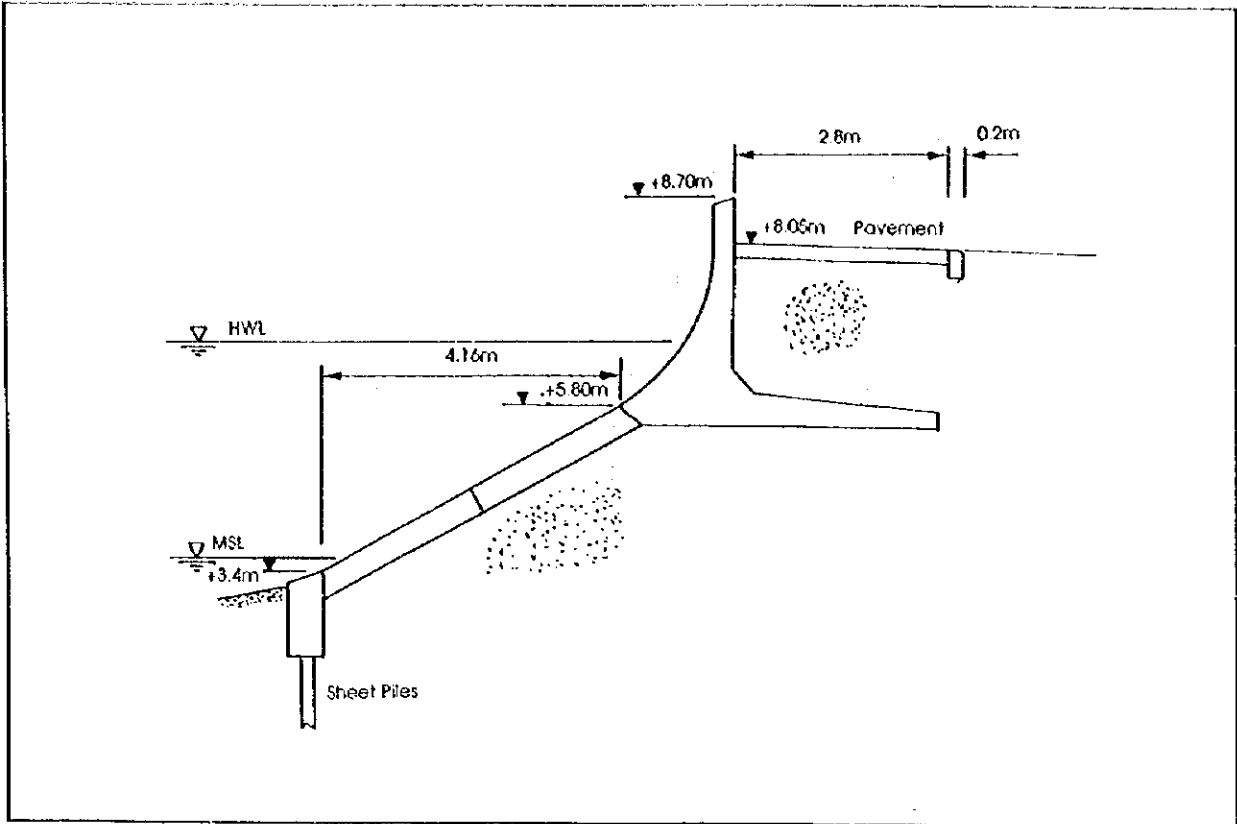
Cross Section of New Seawall along Pungue River (West Side of Capitania)
